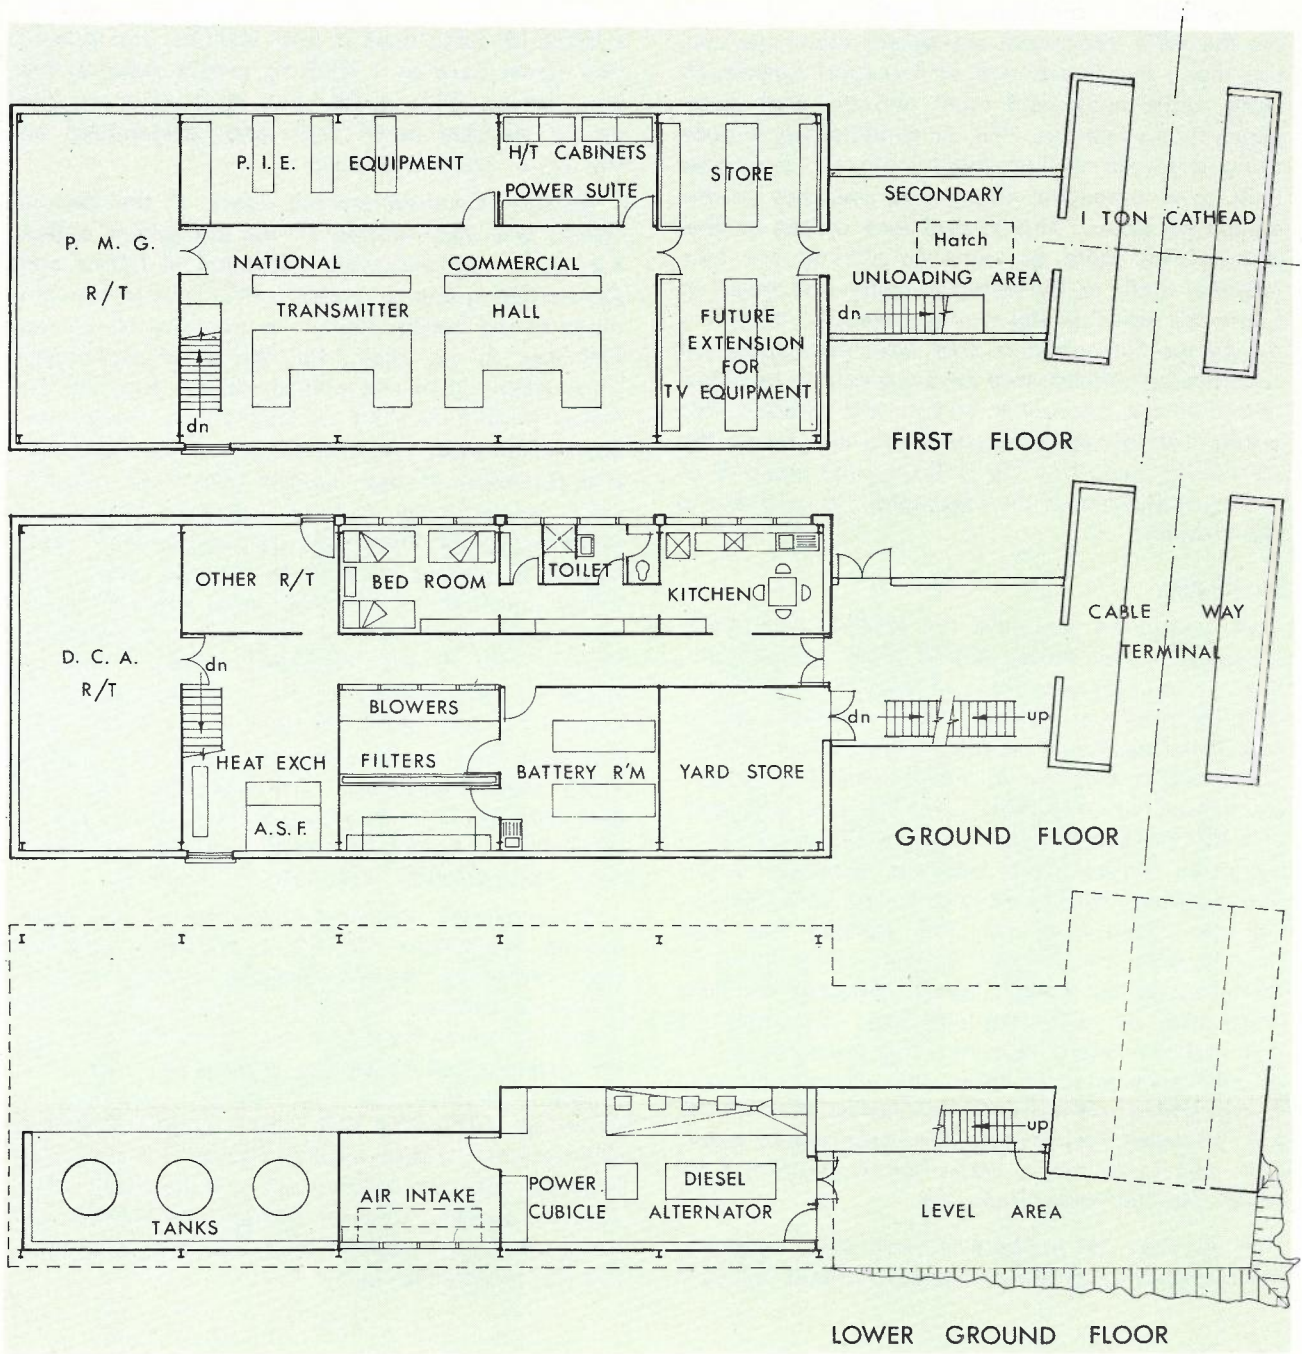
Floor Layout of Top Station Transmitter Building.
